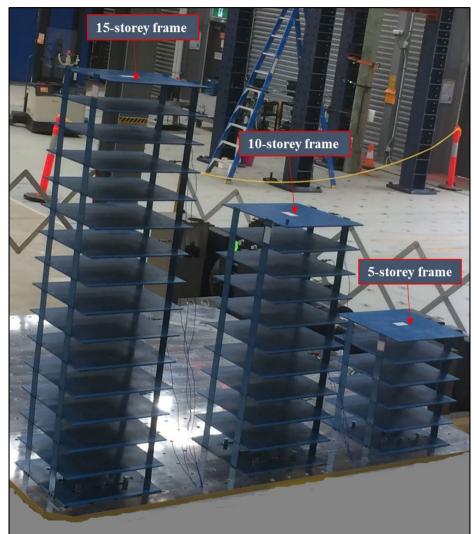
15-storey, 10-storey, and 5-storey steel structural models
